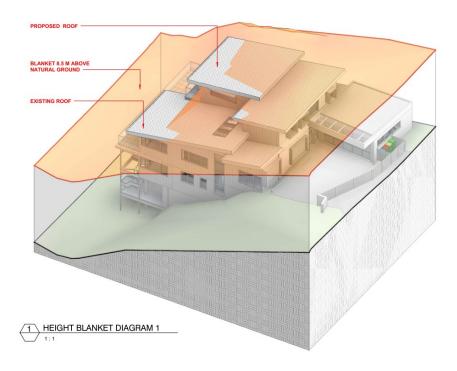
3D modelling depicting existing and proposed areas above 8.5m height limit.
